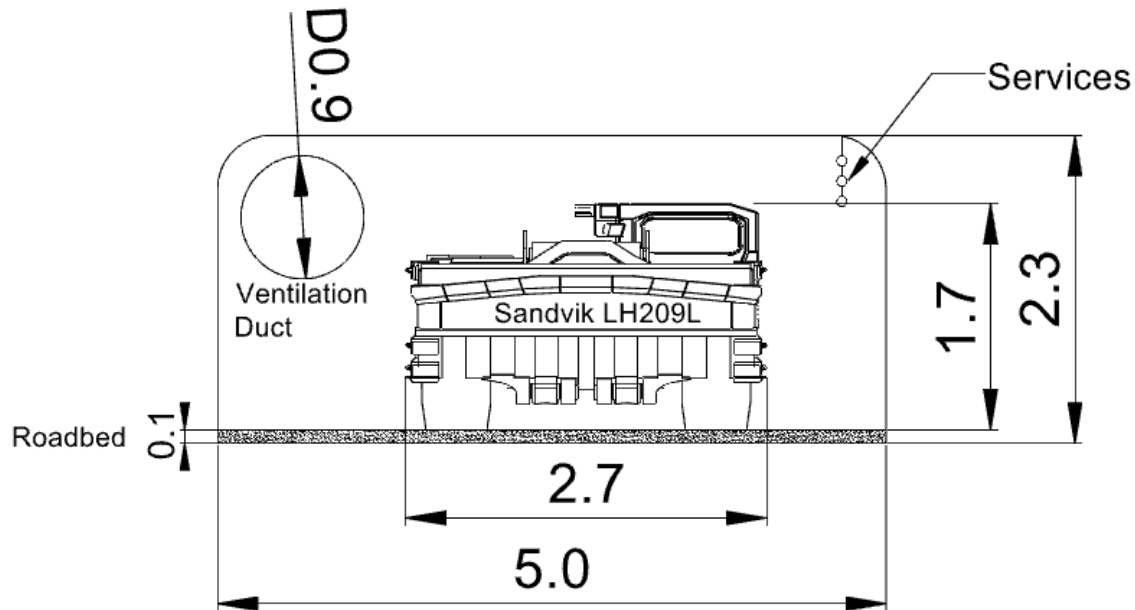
Drift dimensions in mining panels (drift section view with measurements in metre)
